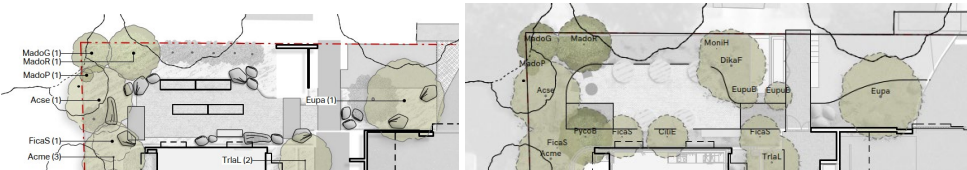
Decision plans (left) and proposed plans (right) showing increase of screening planting
